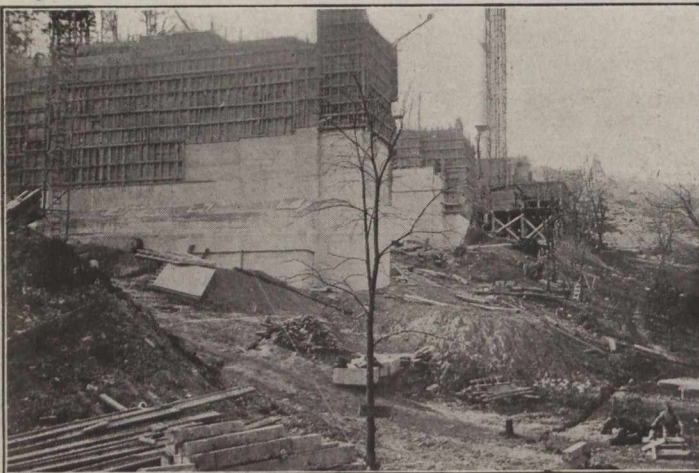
Form Work on Piers F and G—Don Section, Looking West.
